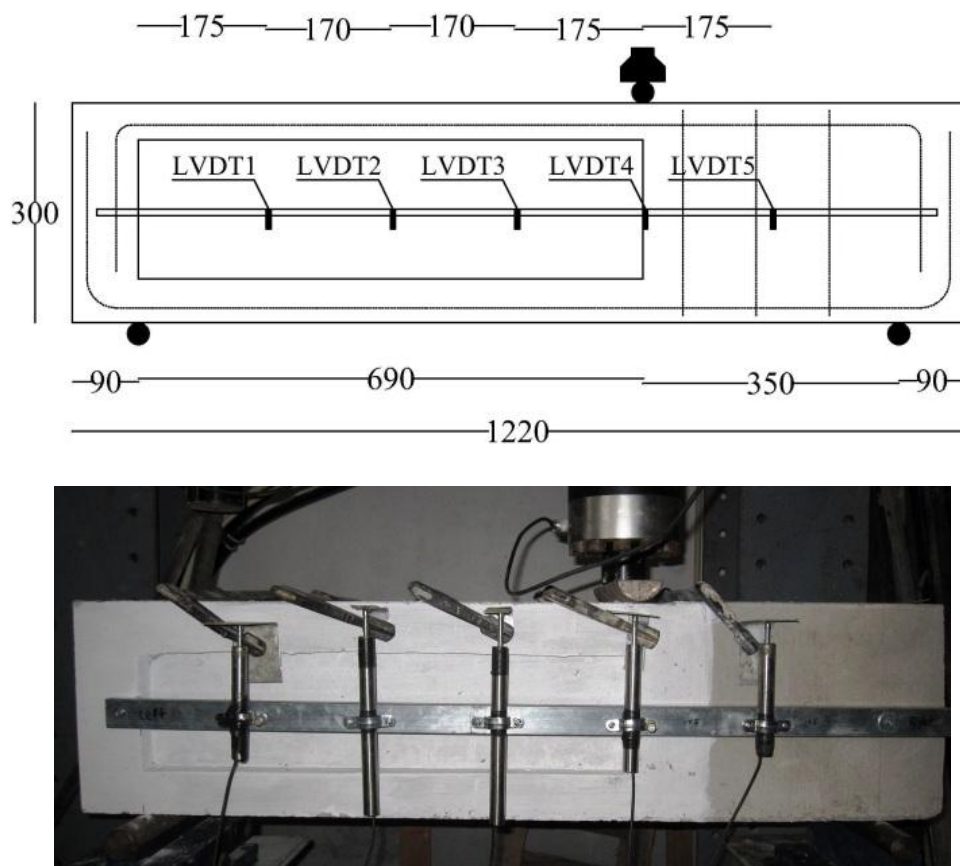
Beam configuration, test setup and position of the LVDTs (dimensions in mm)
